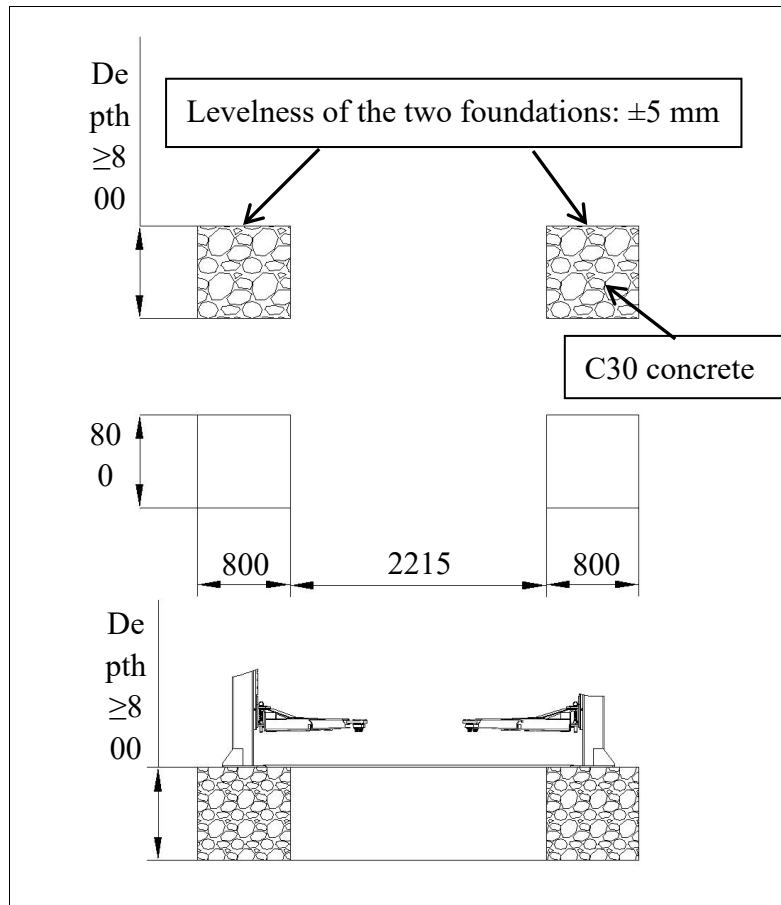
Foundation Dimensions of the Lift (Unit: mm)
